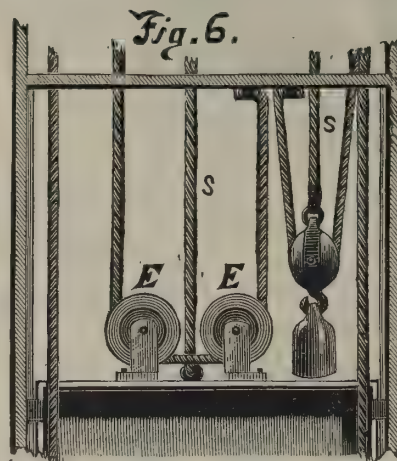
shows the car of waiter hung with the two pulley wheels, E, E, instead of one wheel as shown in Fig. 1. This method is preferable where the car is over 20 inches wide.
